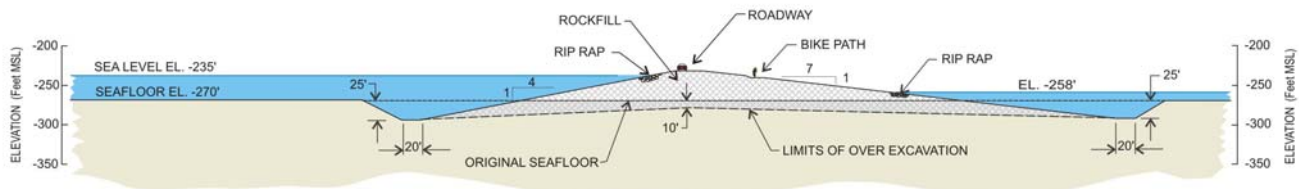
Typical Blanketed Rockfill Impoundment Structure Cross Section.
